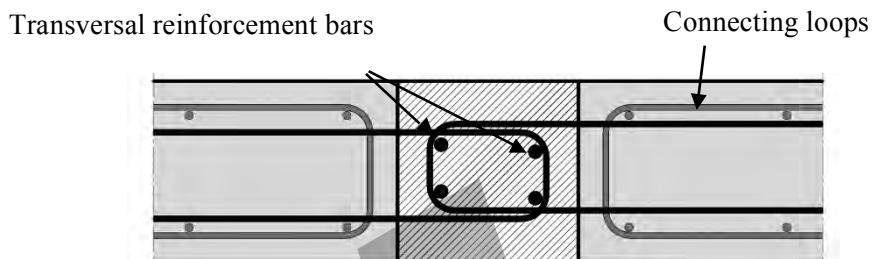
Transversal bar to connect hairpin reinforcements
